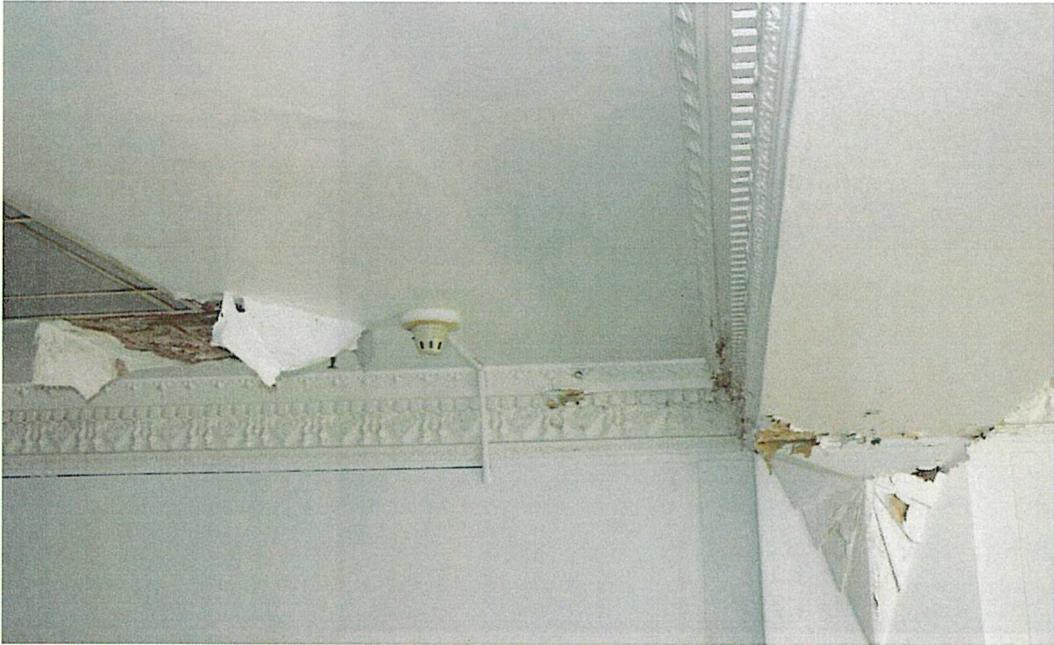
View of ceiling at original skylight above the lobby. Note damage from past water infiltration.
